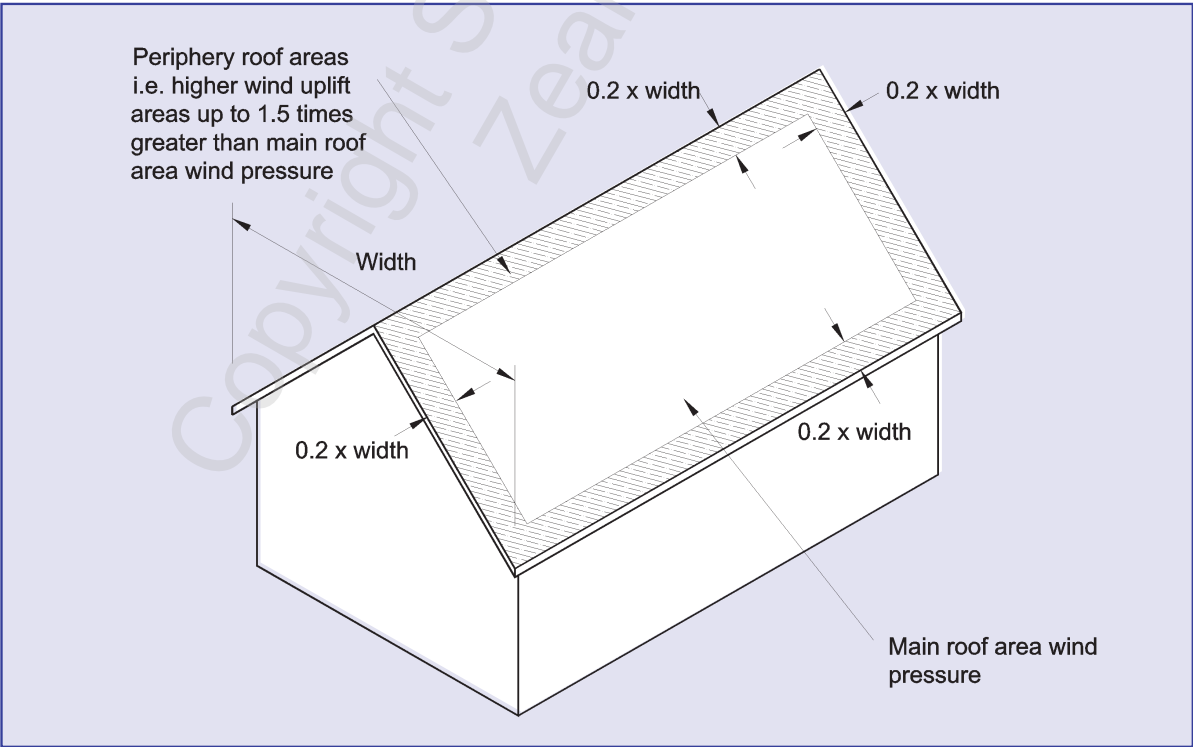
Gable roof showing higher wind uplift areas requiring extra purlin and batten fixings (see table 10.9)
